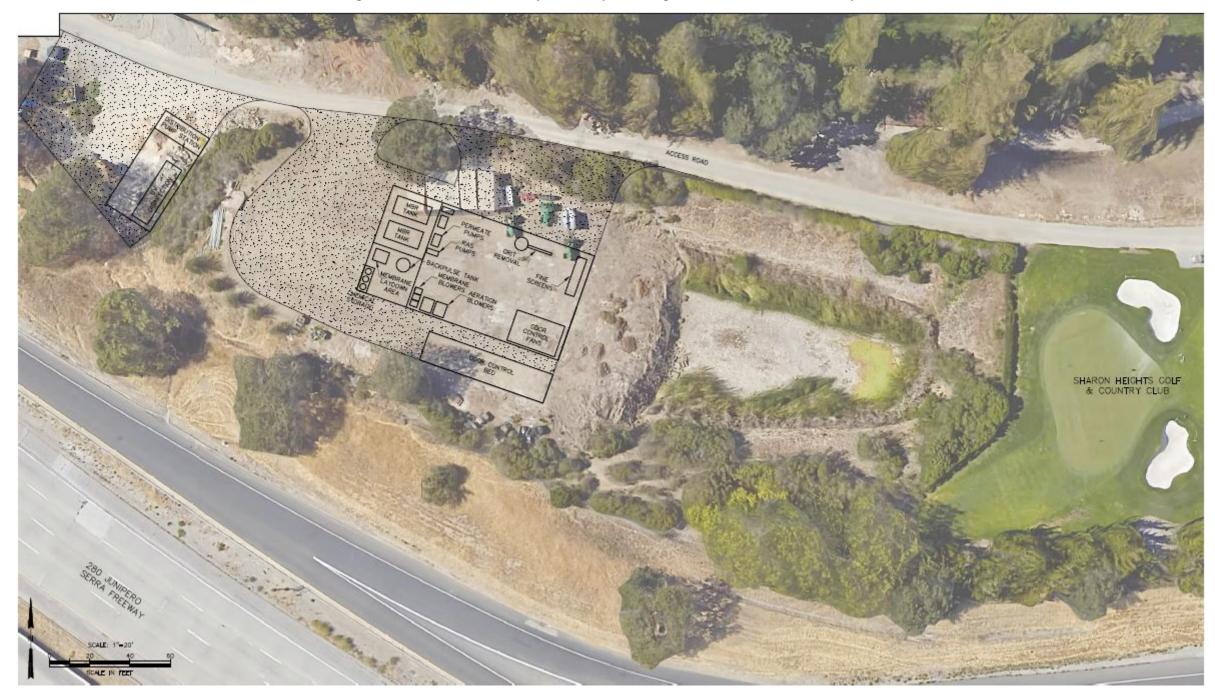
Recommended Project Facility-Planning Level Satellite Treatment Layout
